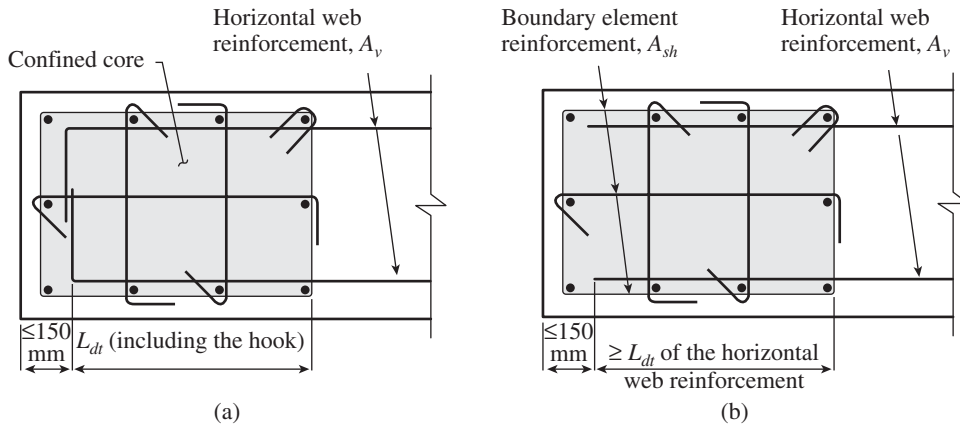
Development of wall horizontal reinforcement in confined boundary element (a) With standard hooks or headed reinforcement (b) With straight bars
